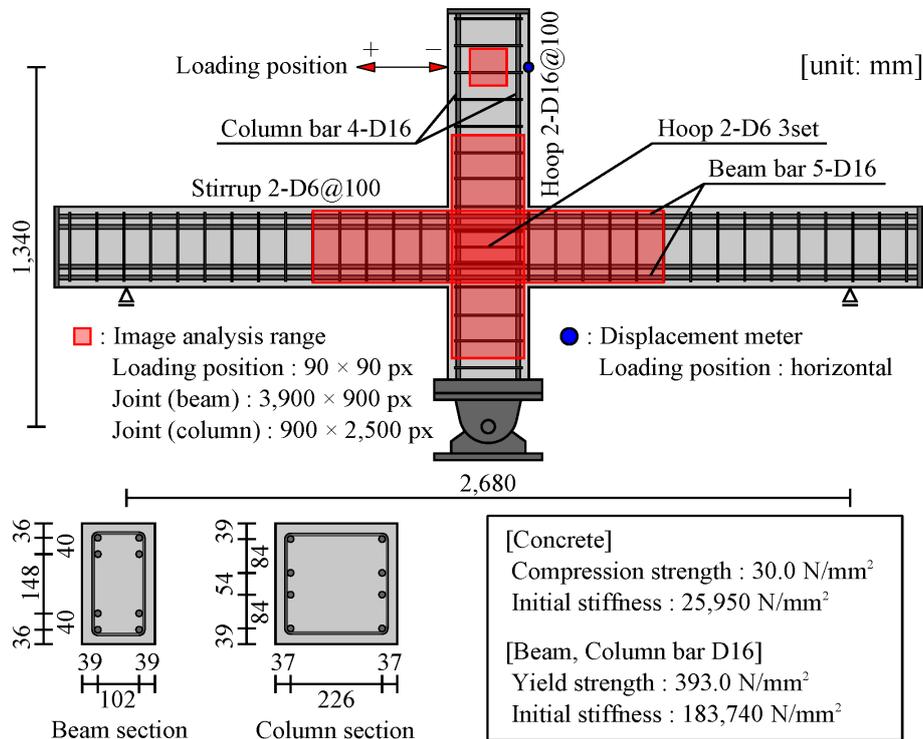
Overview of the cross-shaped RC beam-column joint specimen
